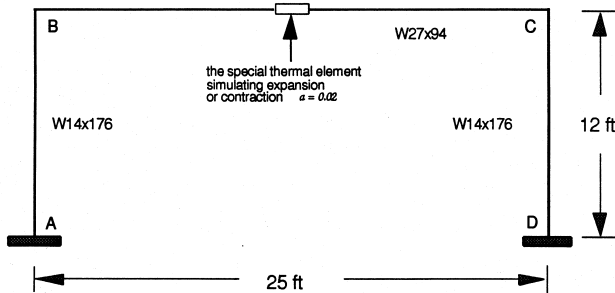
Model for analyzing a steel portal frame with local expansion or contraction at center of girder.
